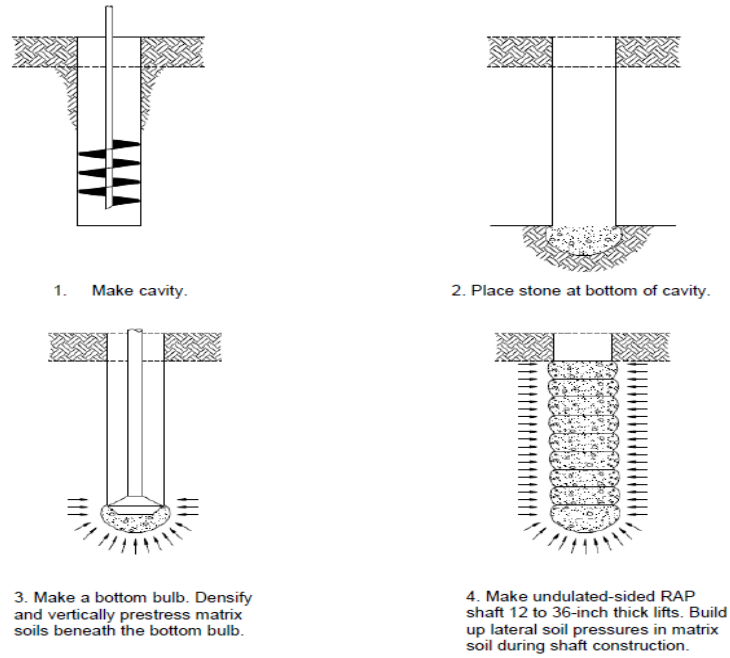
RAP CONSTRUCTION PROCESS USING THE GEOPIER SYSTEM
